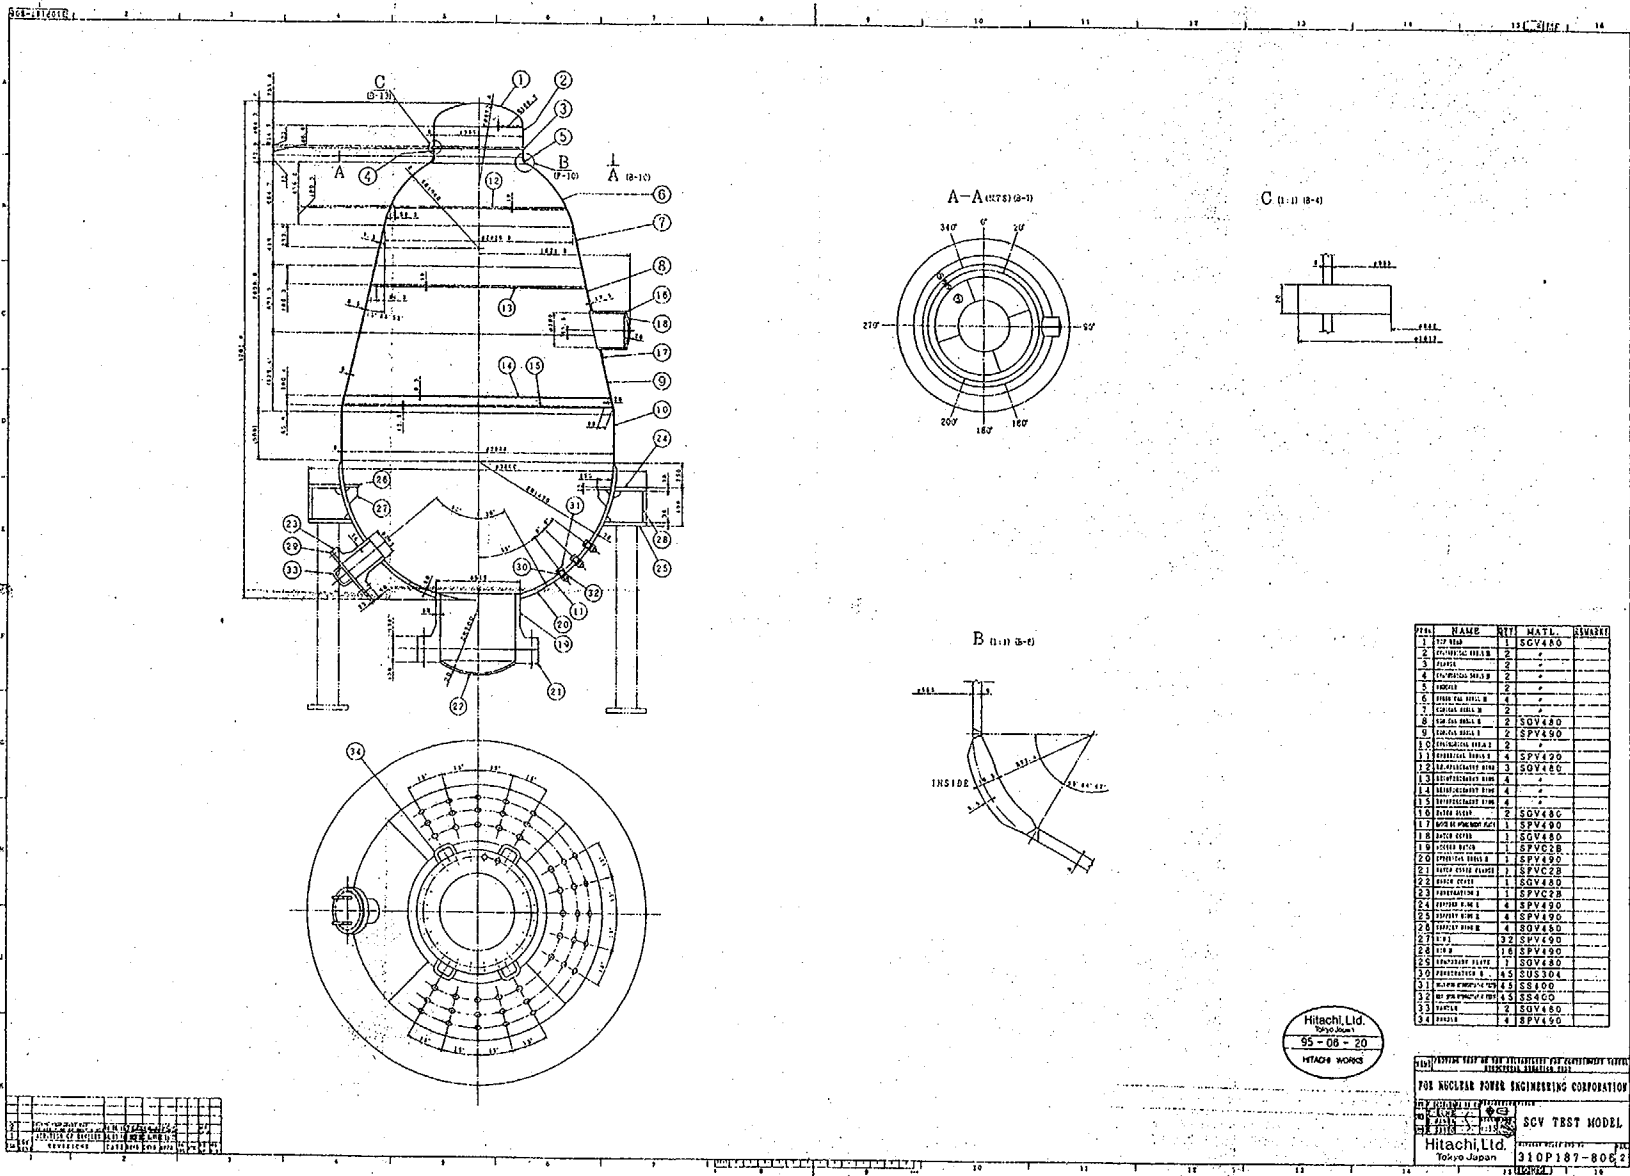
Steel containment vessel (SCV) model - dimensional layout.
